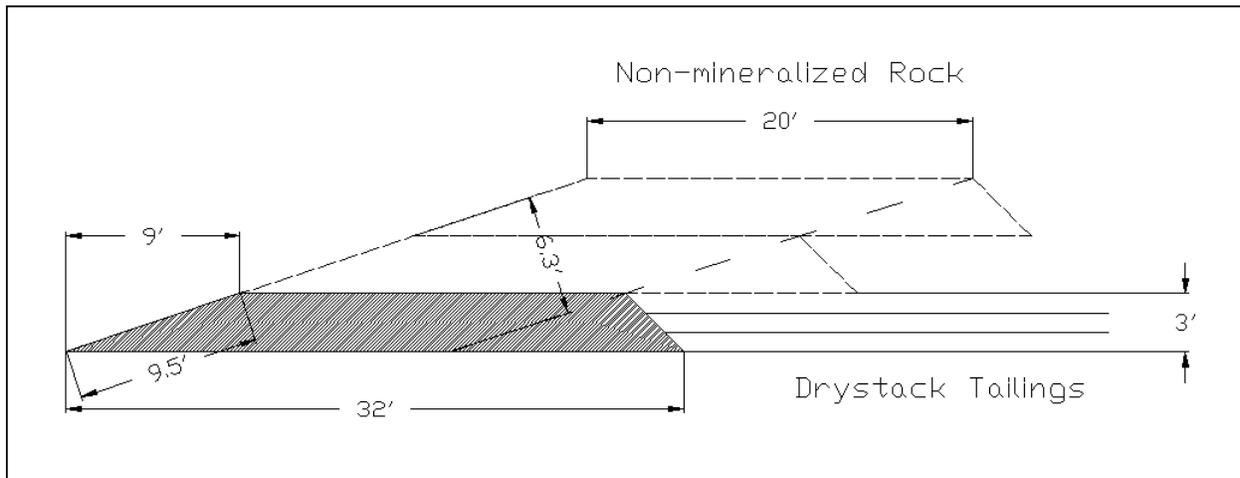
Typical Cross Section of Shell 2 and Shell 3
